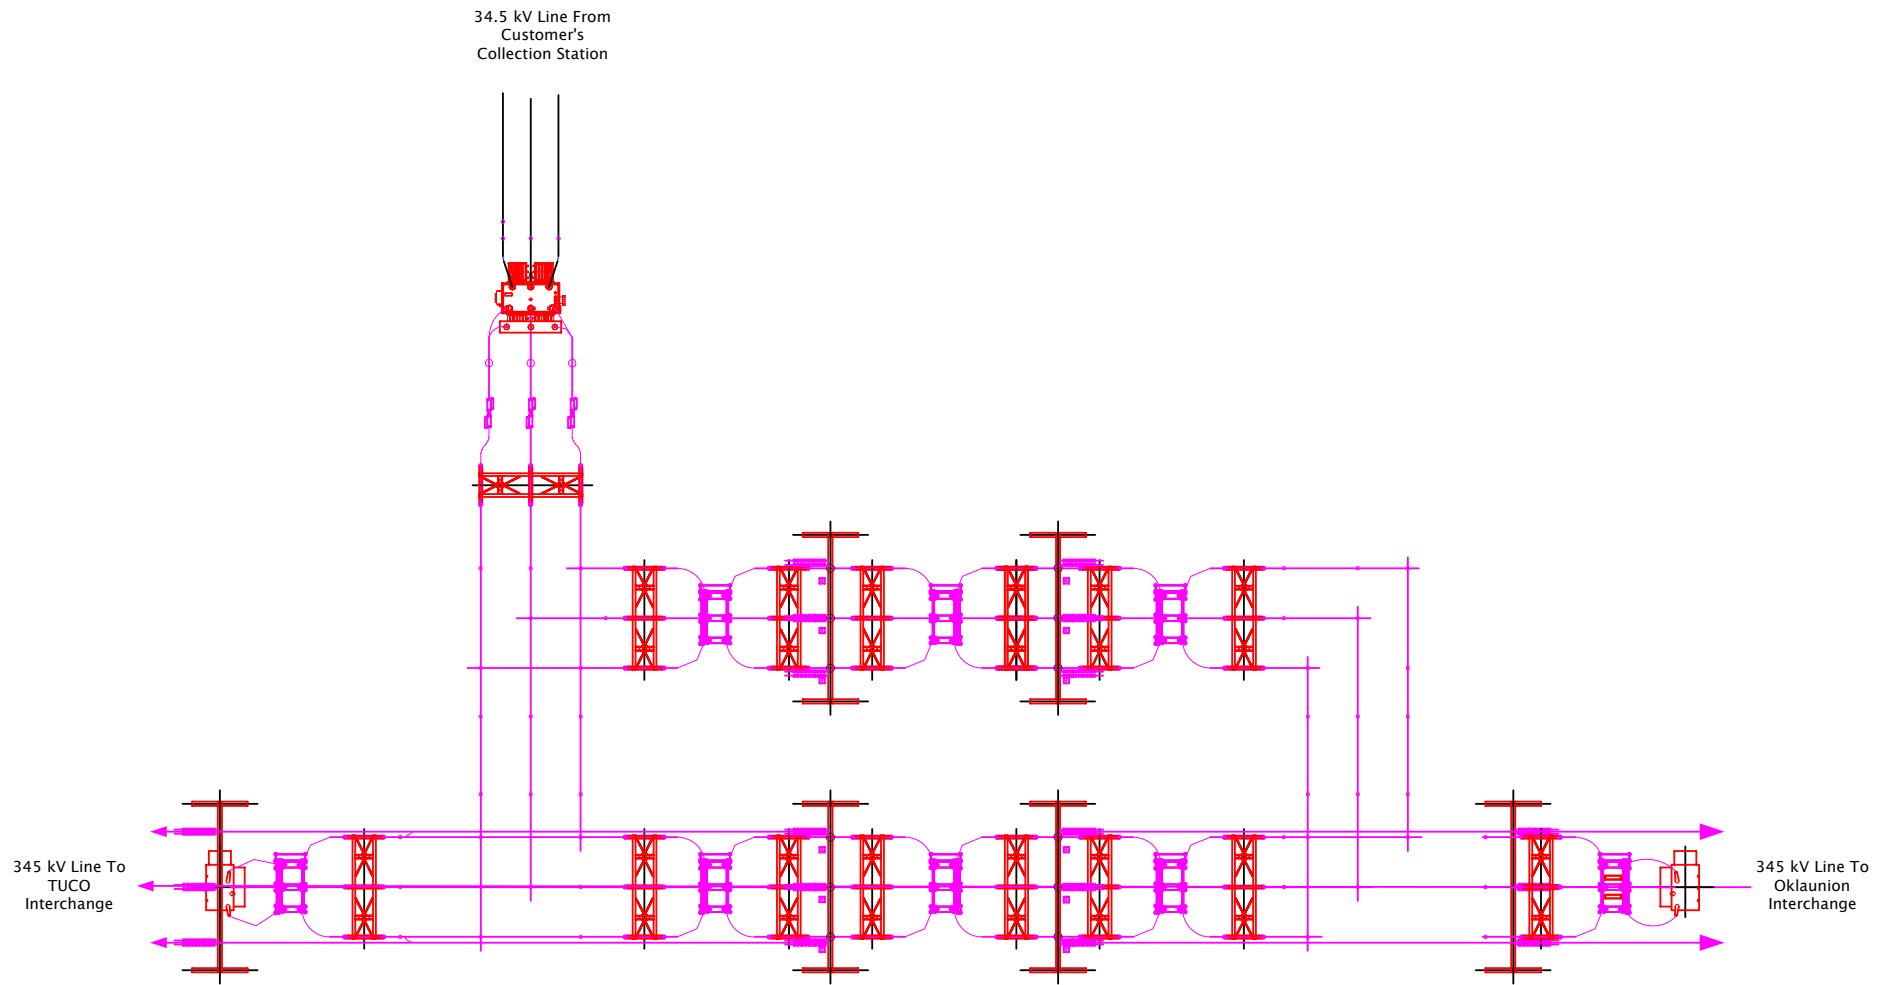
This is a site Layout for 345 kV Cedar Cap Switching Station.
